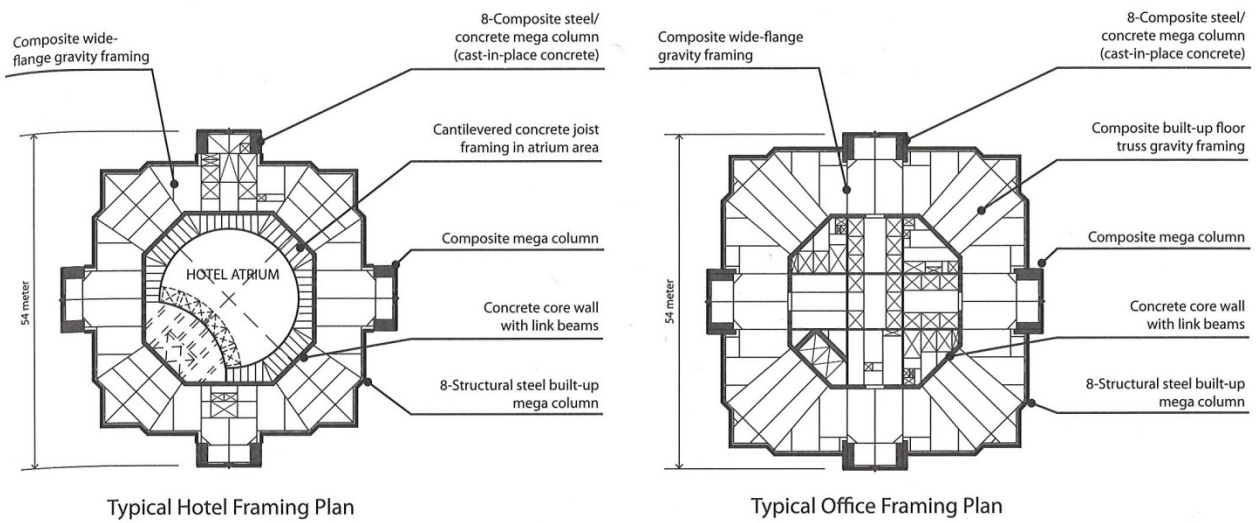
Jin Mao Tower - typical framing plan (Choi et al. 2012)
